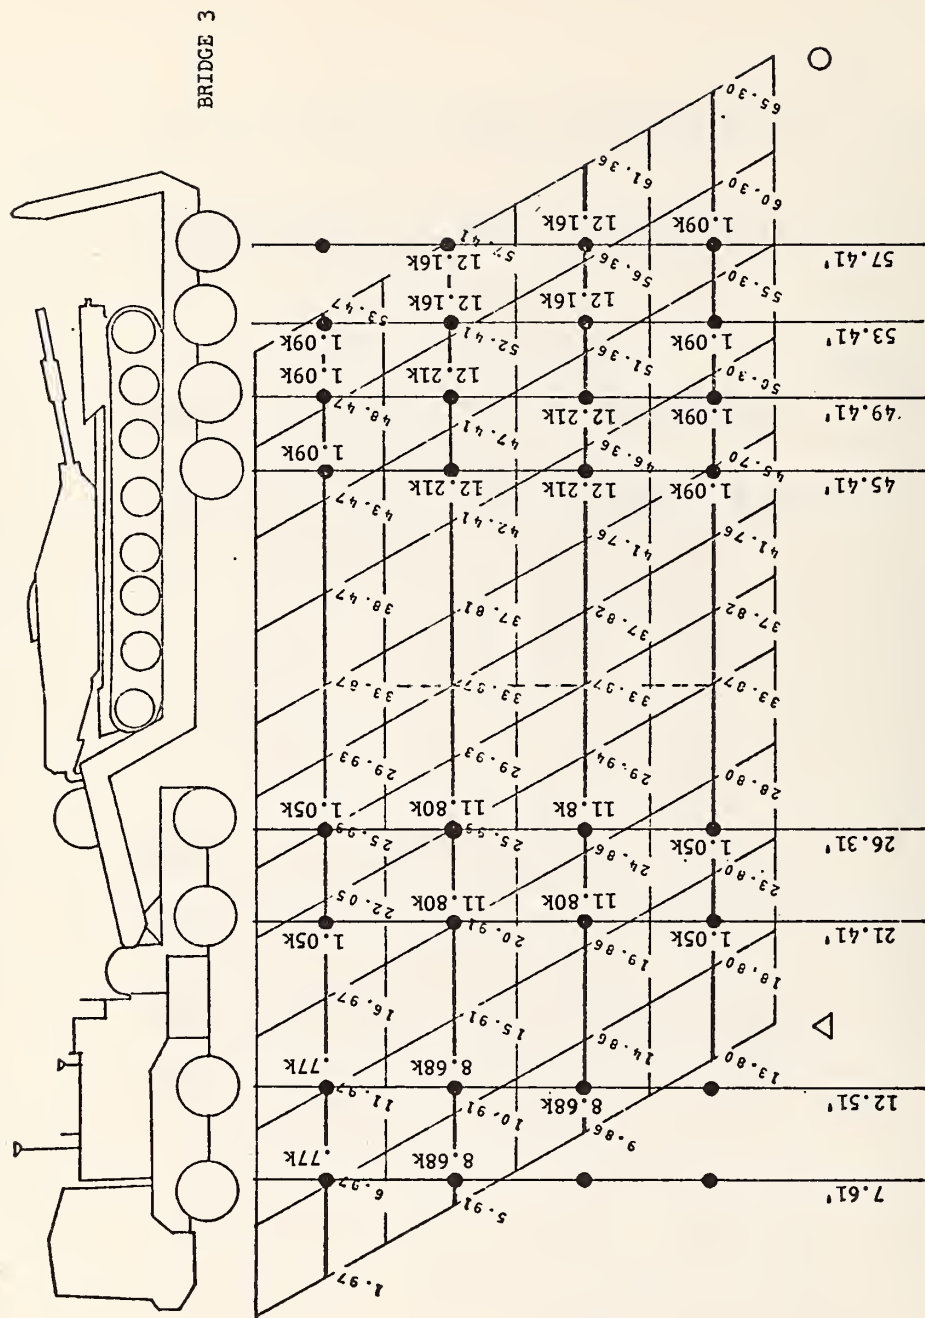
LOAD CONDITION 2, BRIDGE 3. REAR WHEEL OF TRAILER AT END OF INTERIOR GIRDER.
